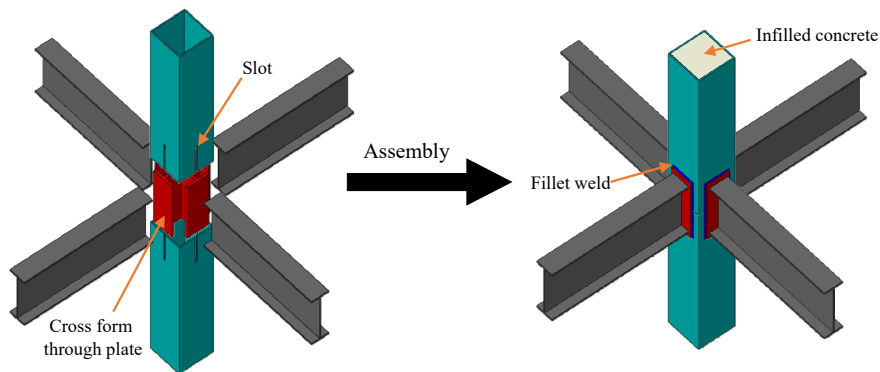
Orthogonal-form configuration of proposed CFT column to H-steel beam connection
